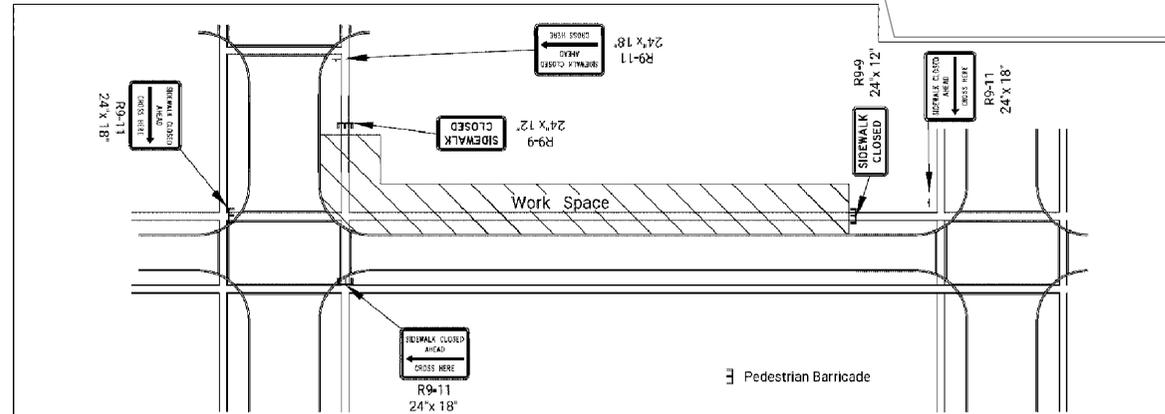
TYPICAL SIGNING FOR SIDEWALK CLOSED WITH OPPOSITE SIDEWALK AVAILABLE
